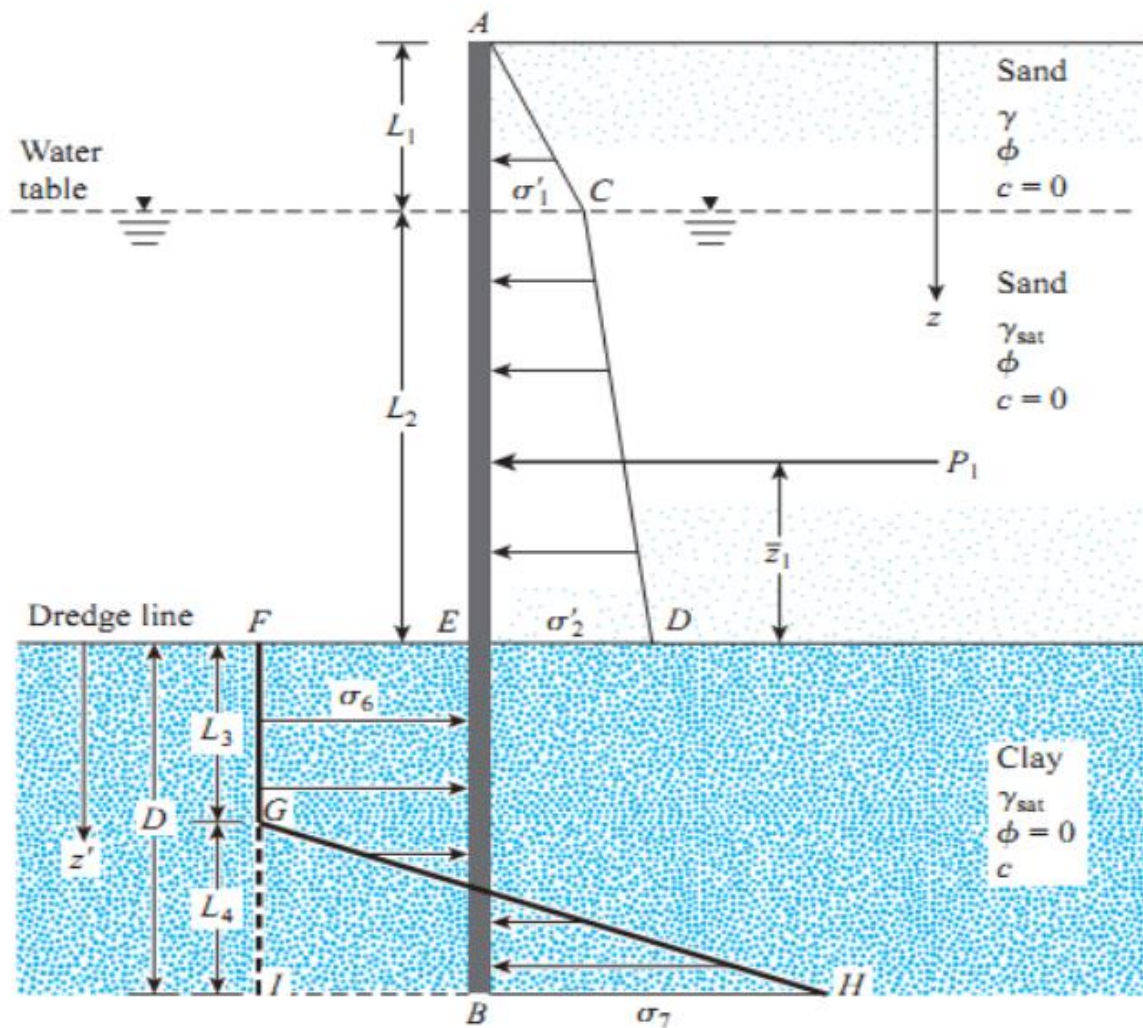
cantilever sheet pile penetrating clay soil [24]
